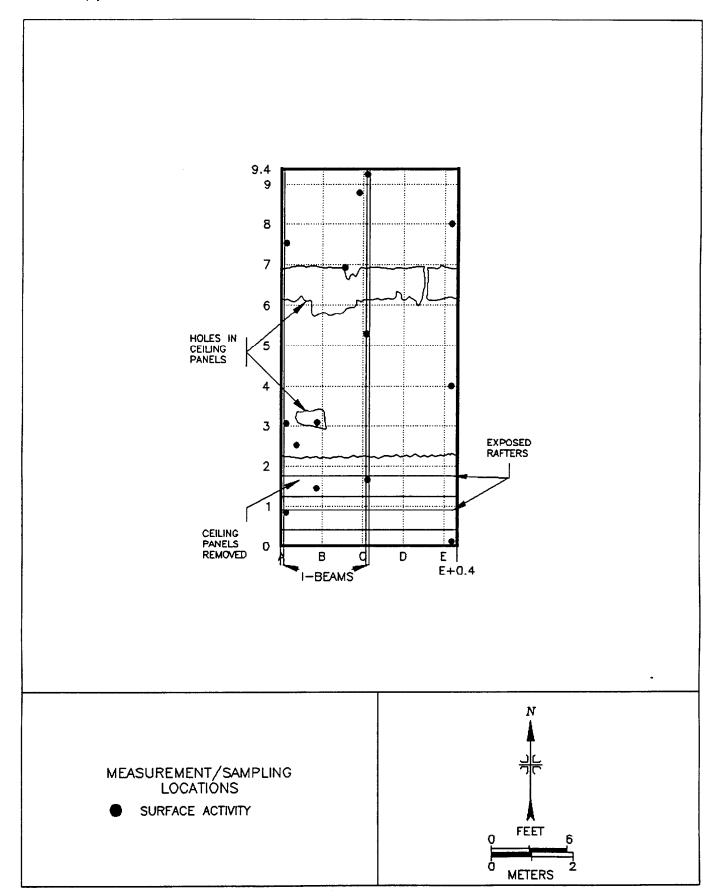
Building 8, Tool Room Ceiling — Measurement and Sampling Locations
